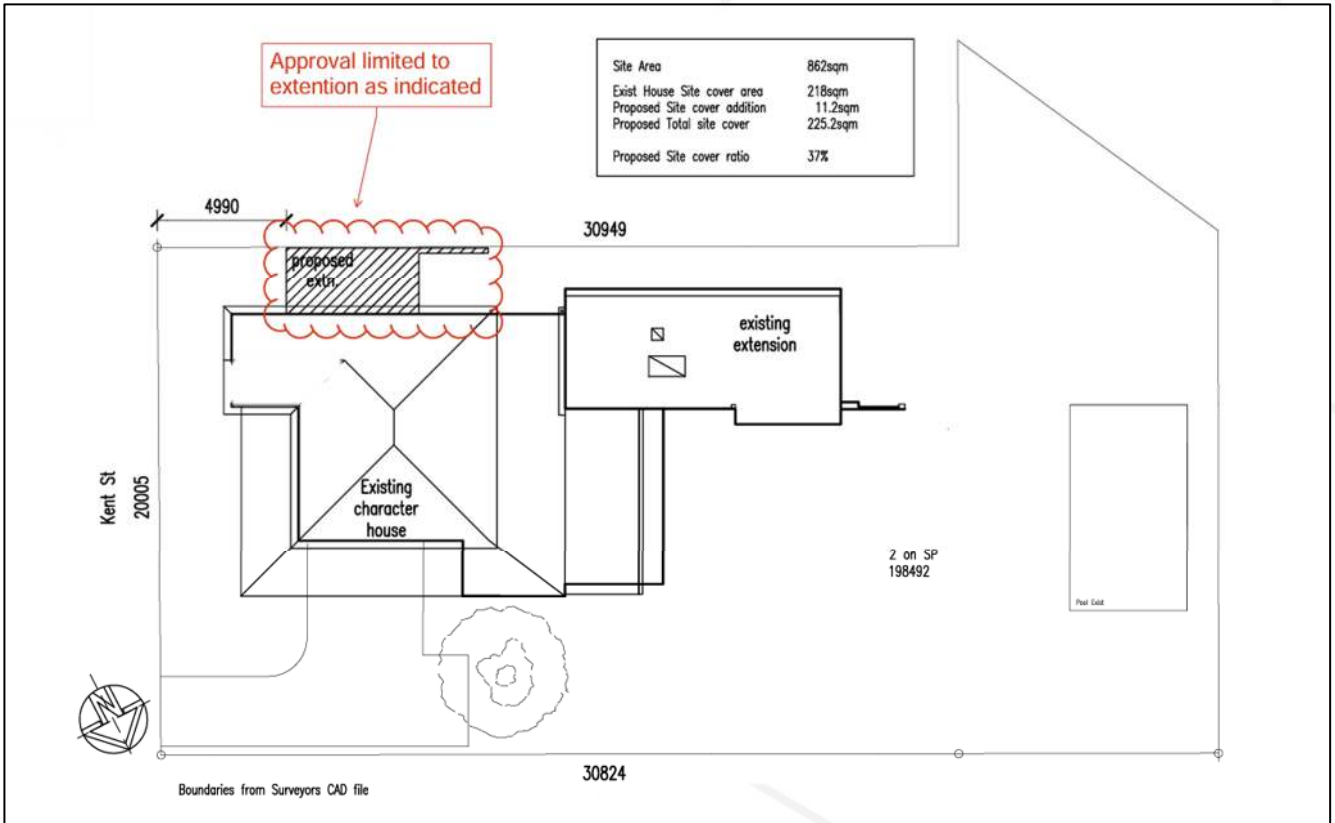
Approved site plan for DA A005169988 (Source: BCC Development i)
